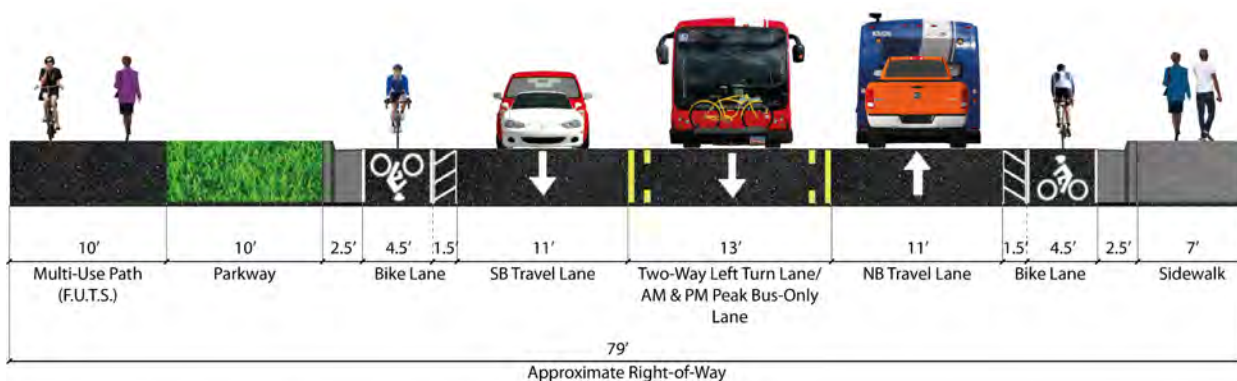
System Alternative 4a Mid-Block Cross Section
